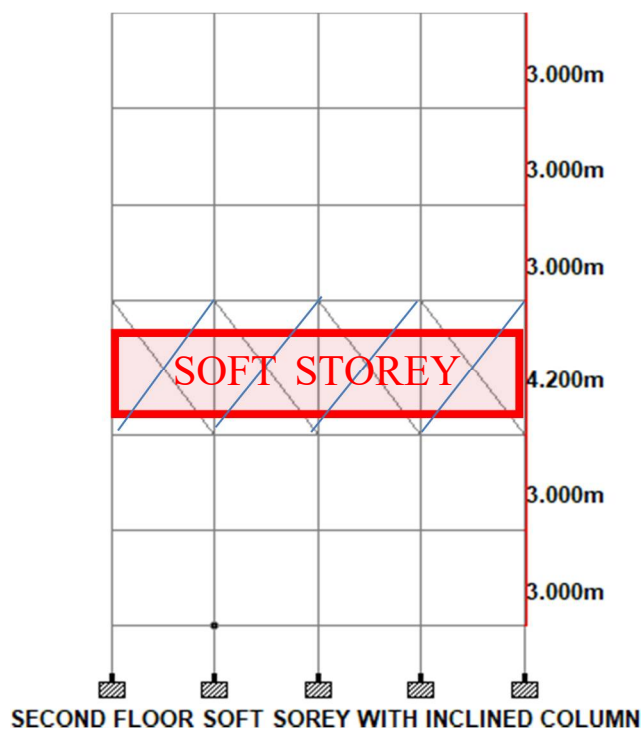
8 SECOND FLOOR SOFT STOREY WITH INCLINED COLUMN (CASE VI)
